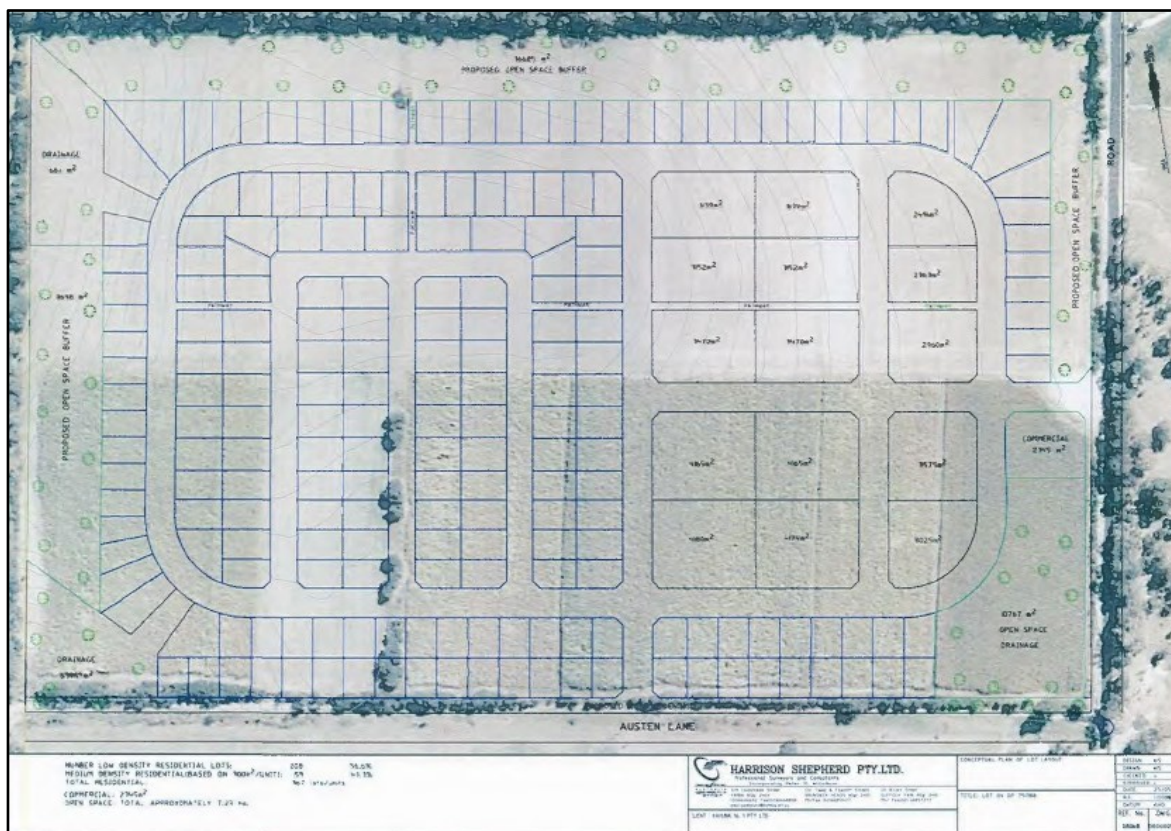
Indicative Concept Plan (source: Planning Proposal, Harrison Shepherd Pty Ltd April 2011)
